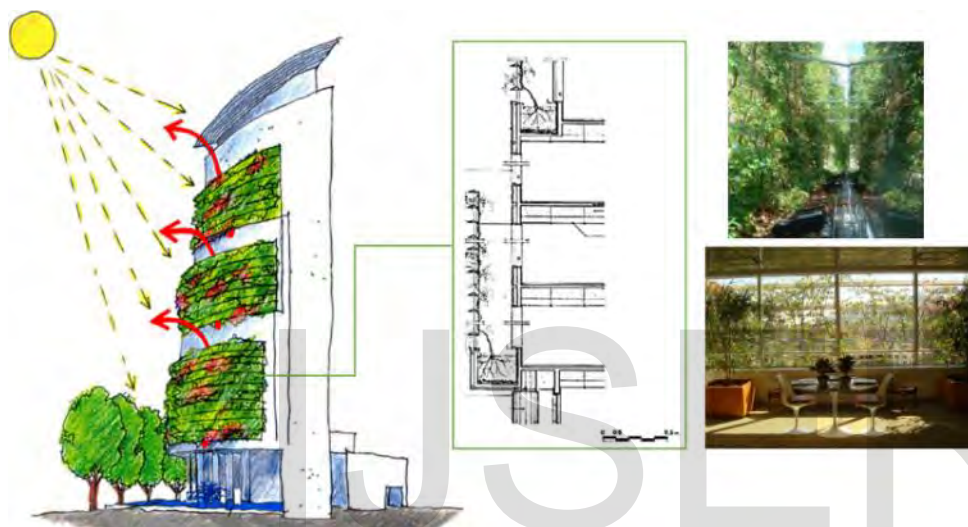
Concept of double layered façade along with its detail in 'Consortio' Building
